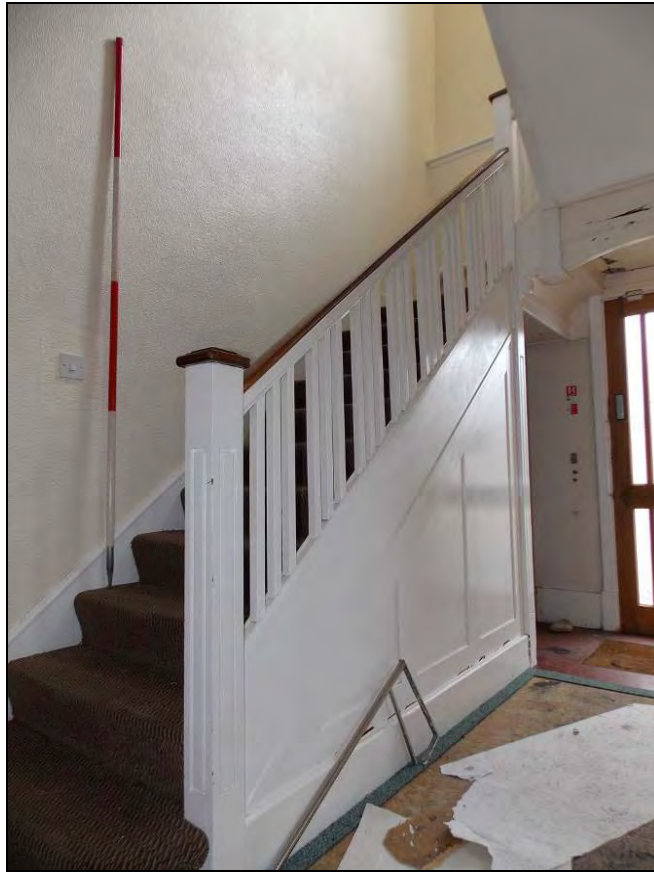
Staircase to the first floor, looking south-east (scale 2m).
